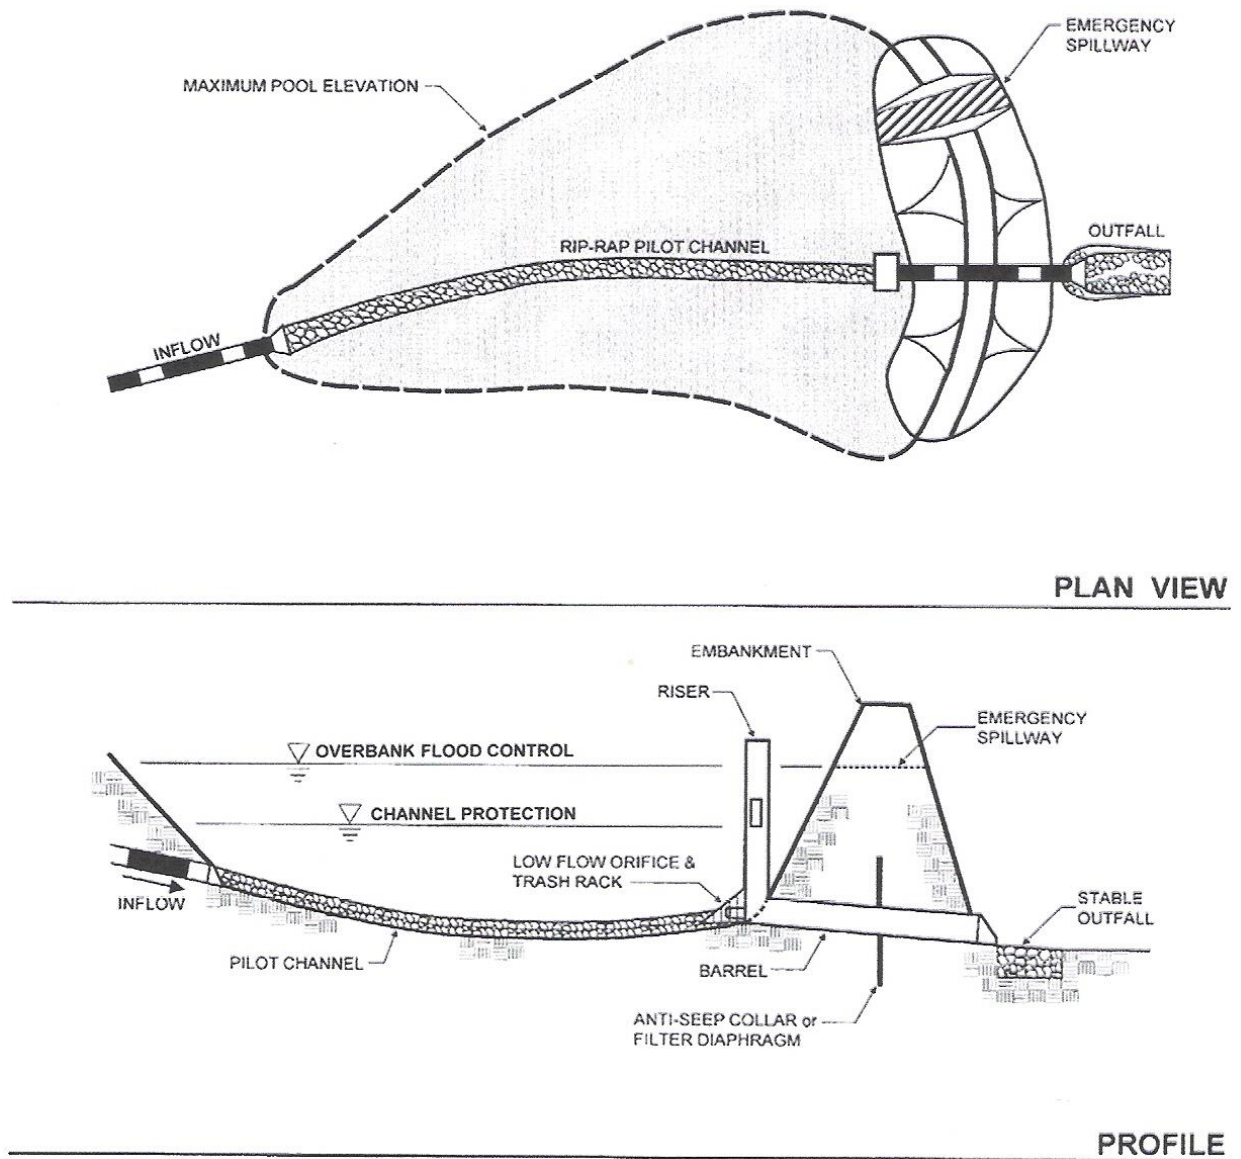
Plan and Section view of Dry Detention Pond (RIDEM-2010)
